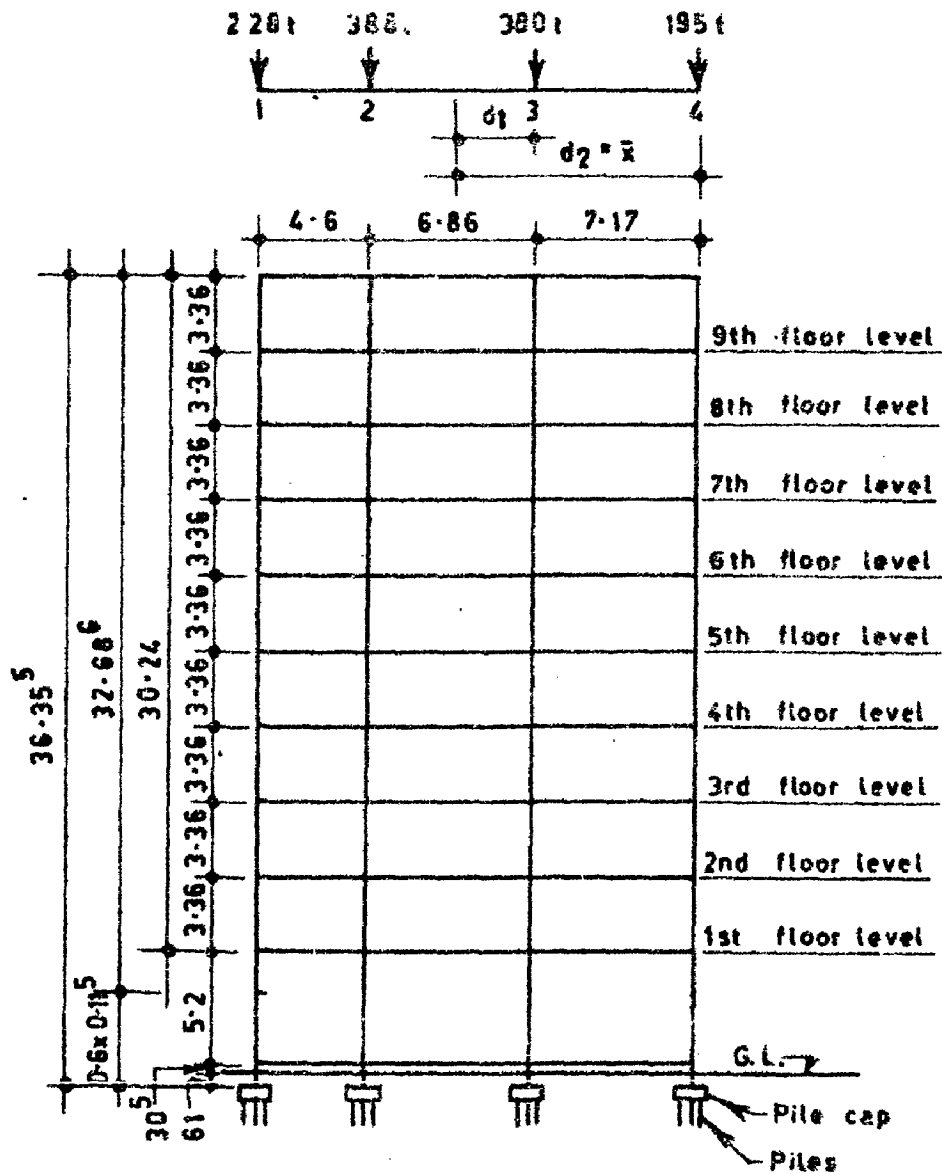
Sketch showing different floor heights and loads at a typical section
